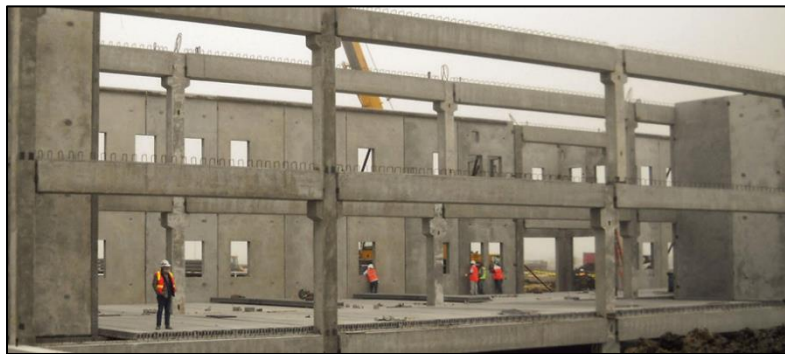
On-site typical beam-to-column connection layout (Chahal, 2016)
